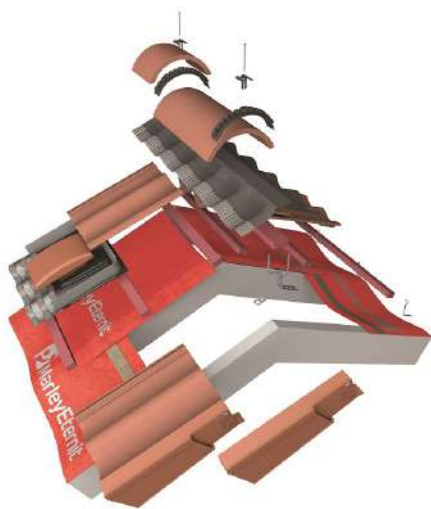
Installation of slate and tiles of pitched roof according to BS 5334
